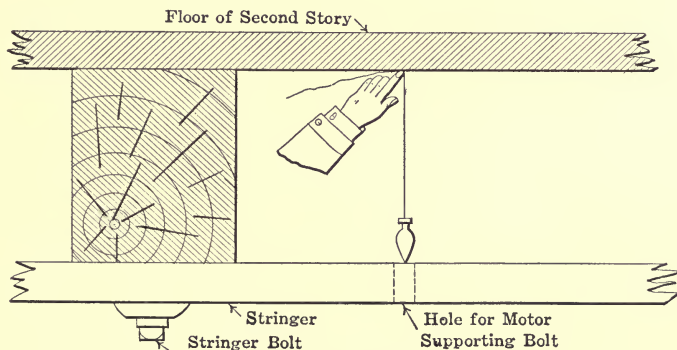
METHOD OF LOCATING BOLT HOLES.
